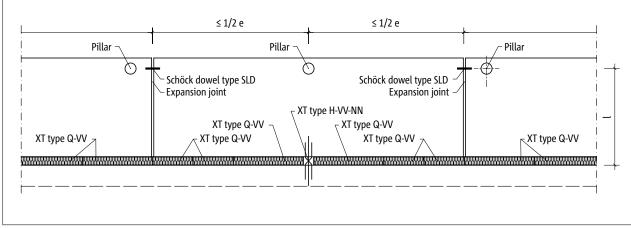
Schöck Isokorb® XT type H: Expansion joint arrangement
